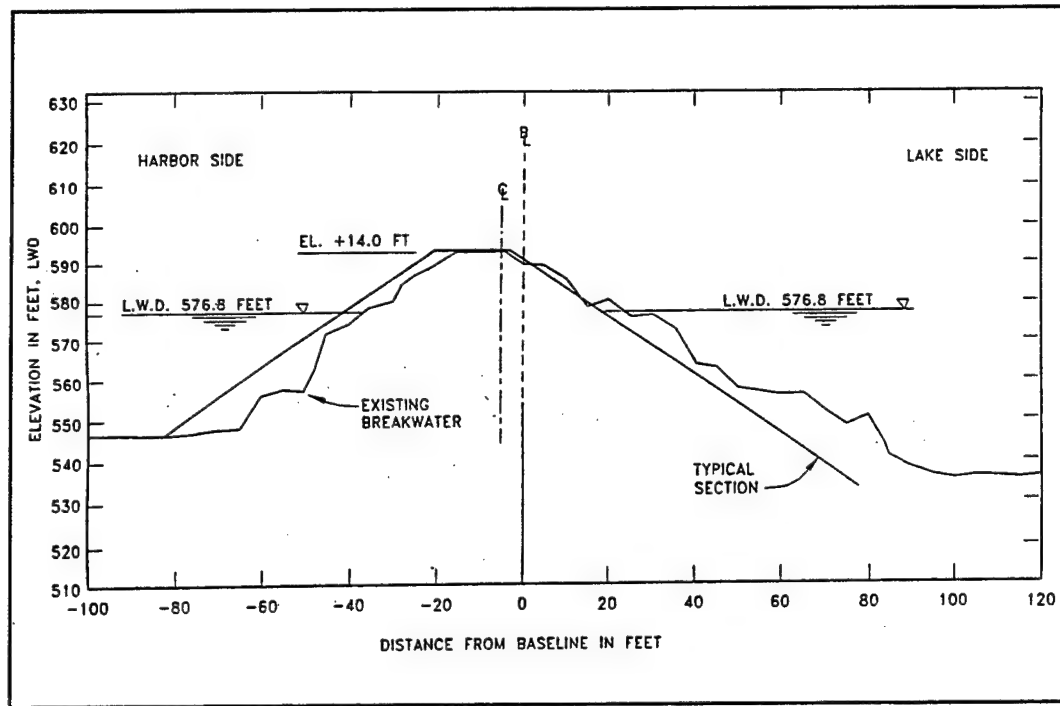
1985 Survey cross section, Station 32 + 00
